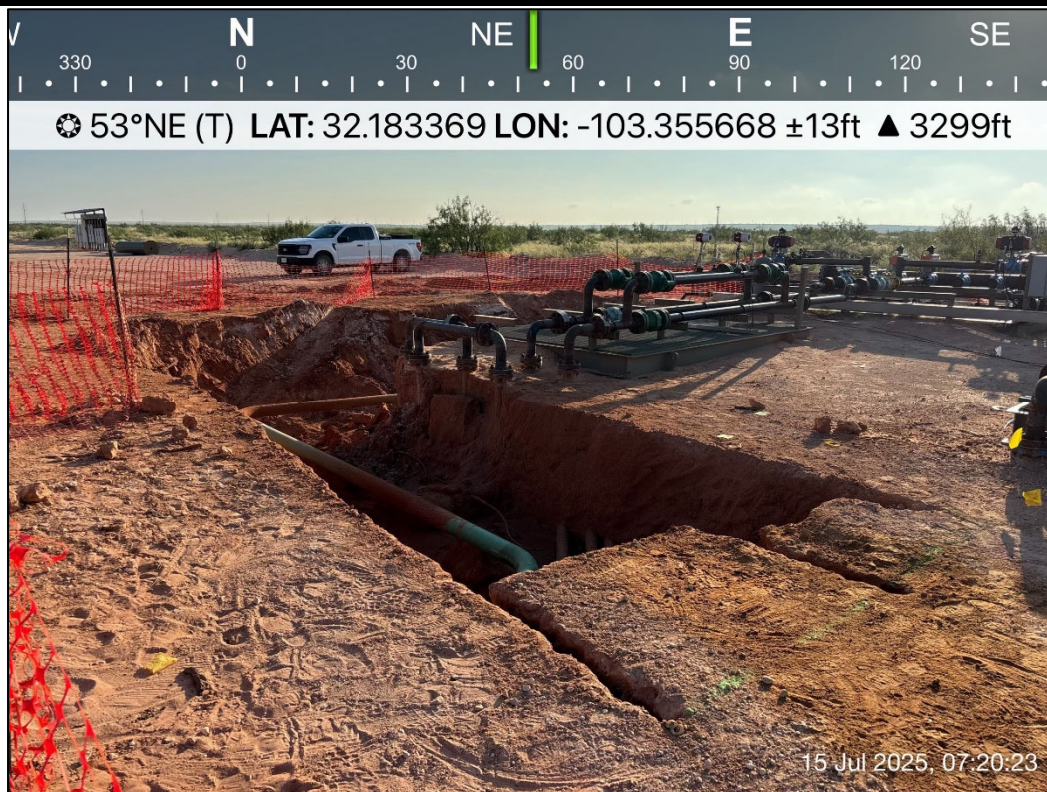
Northeast view of excavation extent. 7/15/2025
